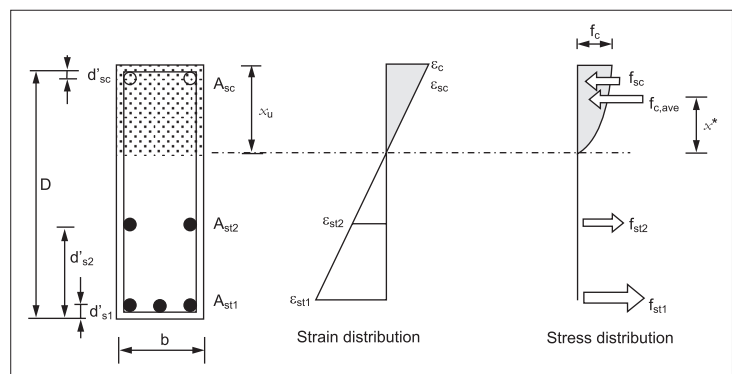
Geometry, strain states and stress states of concrete and steel reinforcement bars in a reinforced concrete section.
